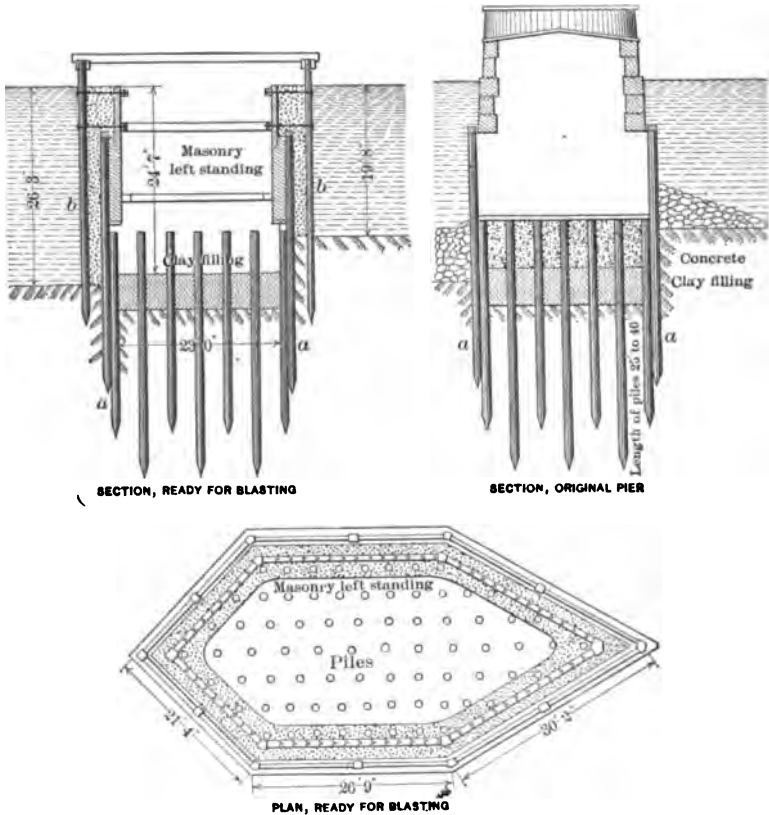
REMOVAL OF MASONRY PIER AT STETTIN, GERMANY.
